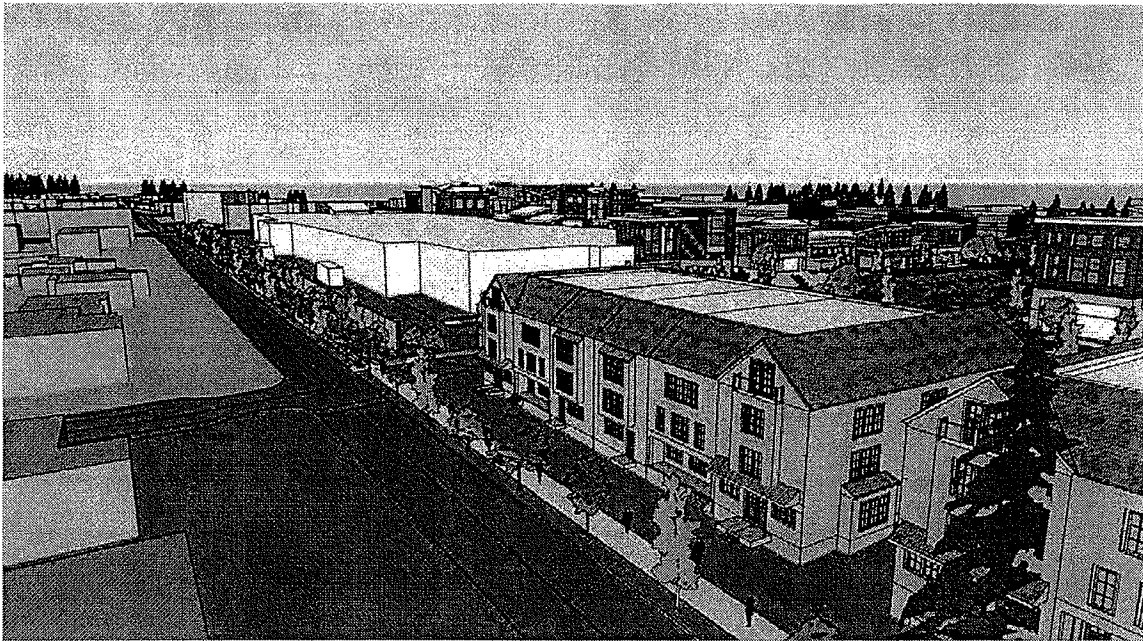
Linden Avenue N looking North towards N 182nd Street
